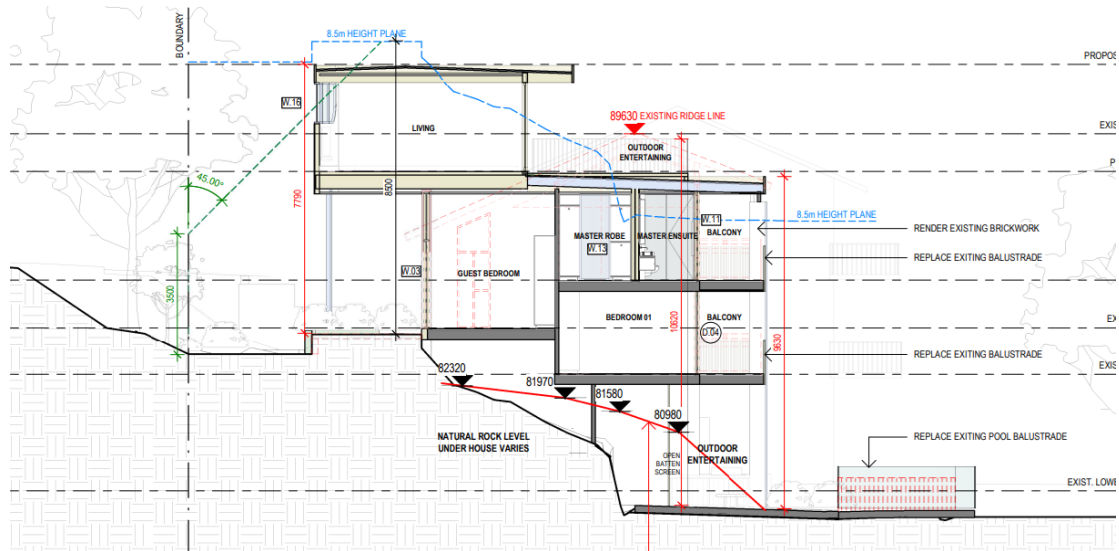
Section Plan – encroachment to the 8.5m height is detailed.
